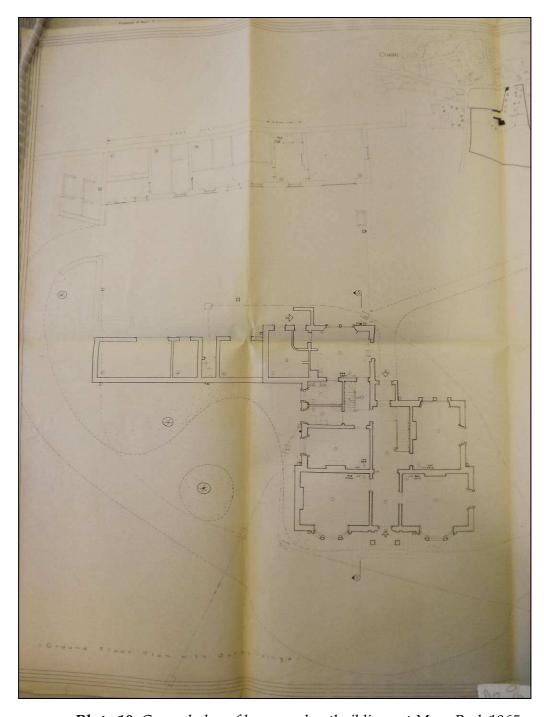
Ground plan of house and outbuildings at Moor Park 1965
